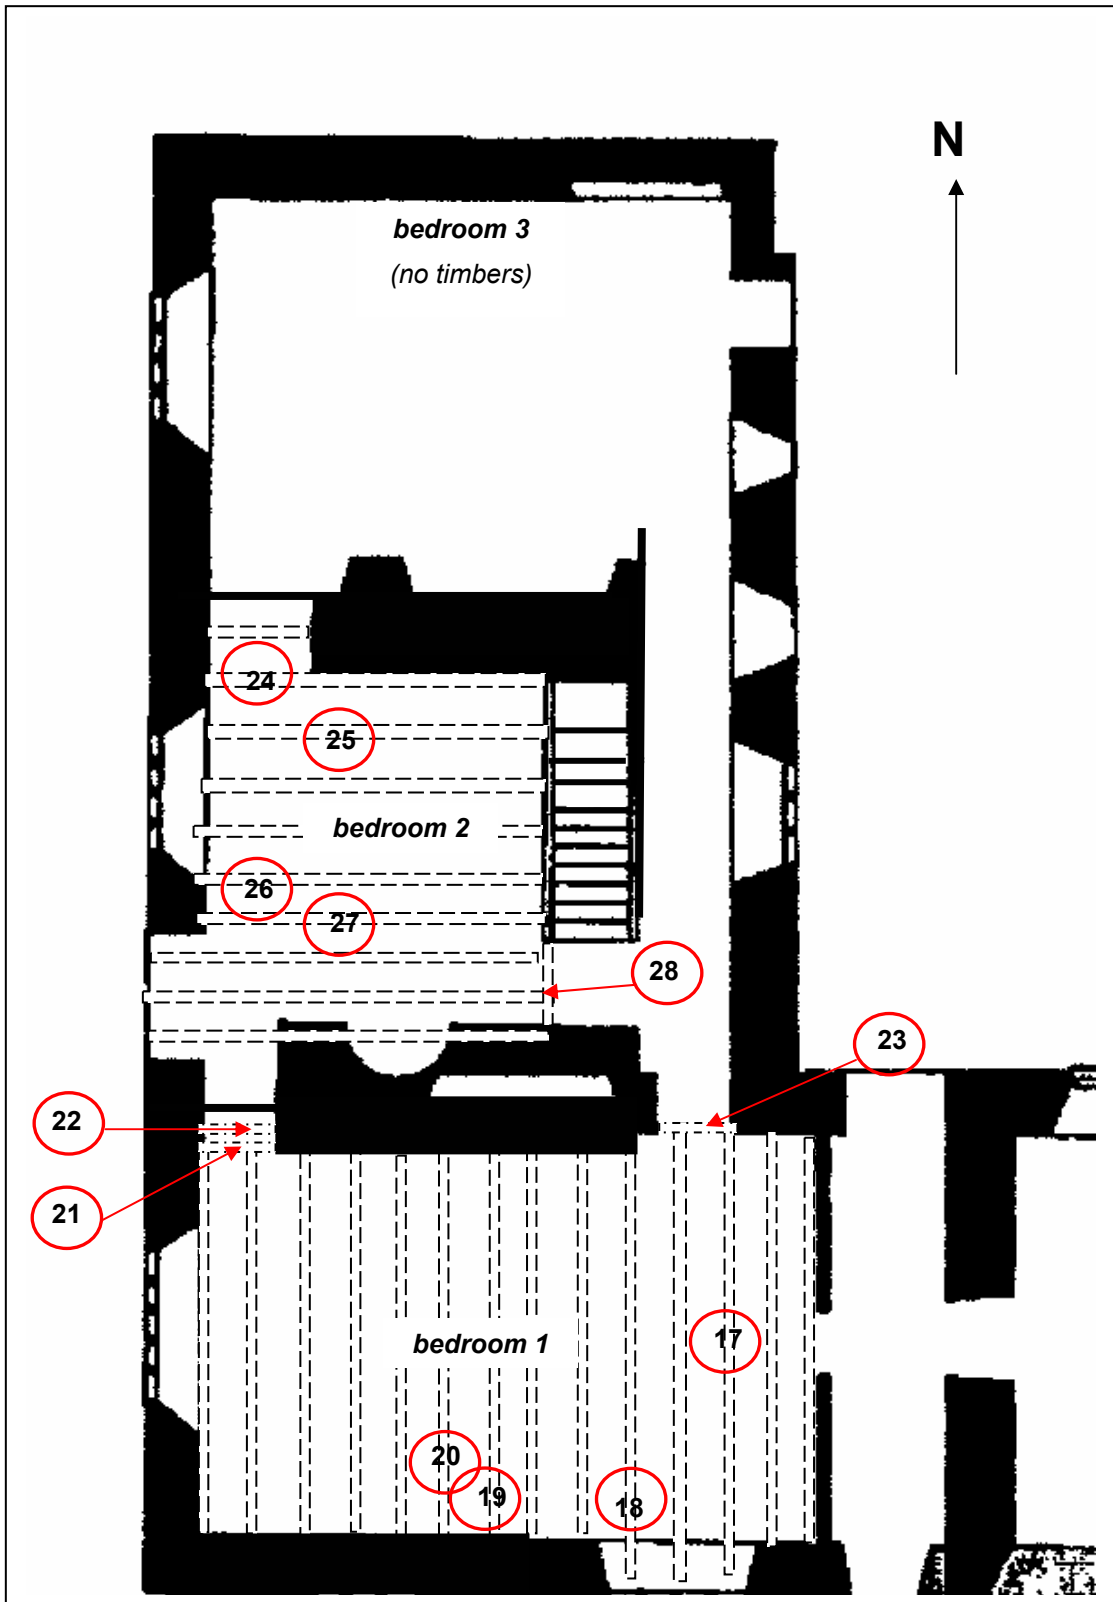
Farmhouse, first-floor rooms to show approximate location of sampled timbers
